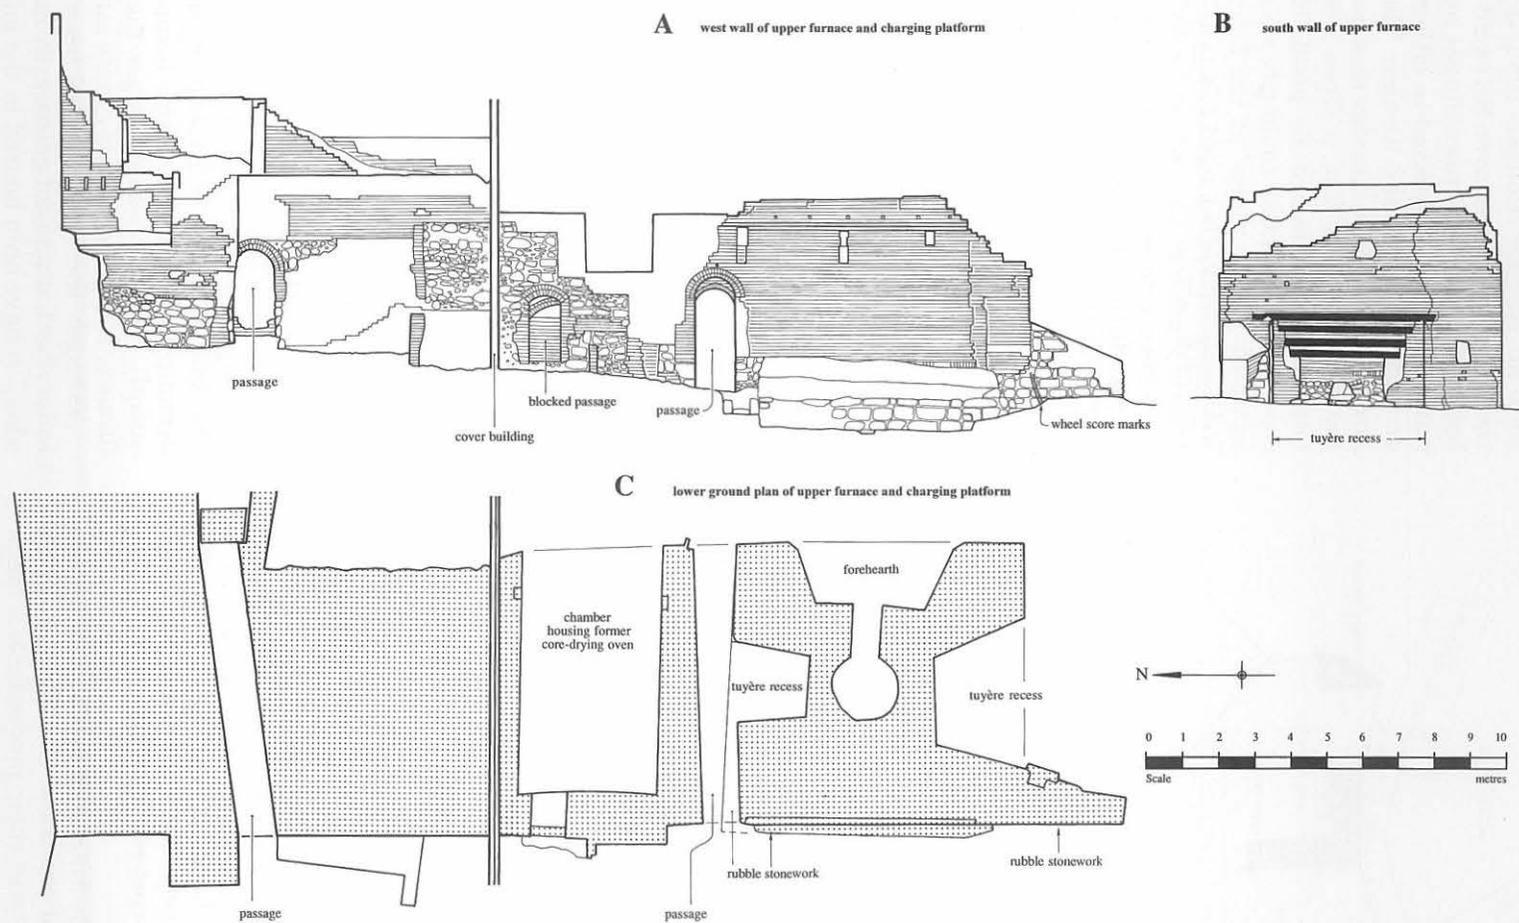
Ground plan of the upper furnace and charging platform (C), with the west (A) and south (B) elevations. The west elevation shows the rubble stone of the original furnace and part of the wheelpit wall.
